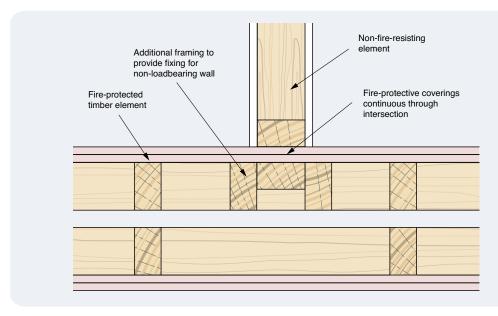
Junction of non-fire-resistant wall with fire-protected timber wall including additional framing detail.
